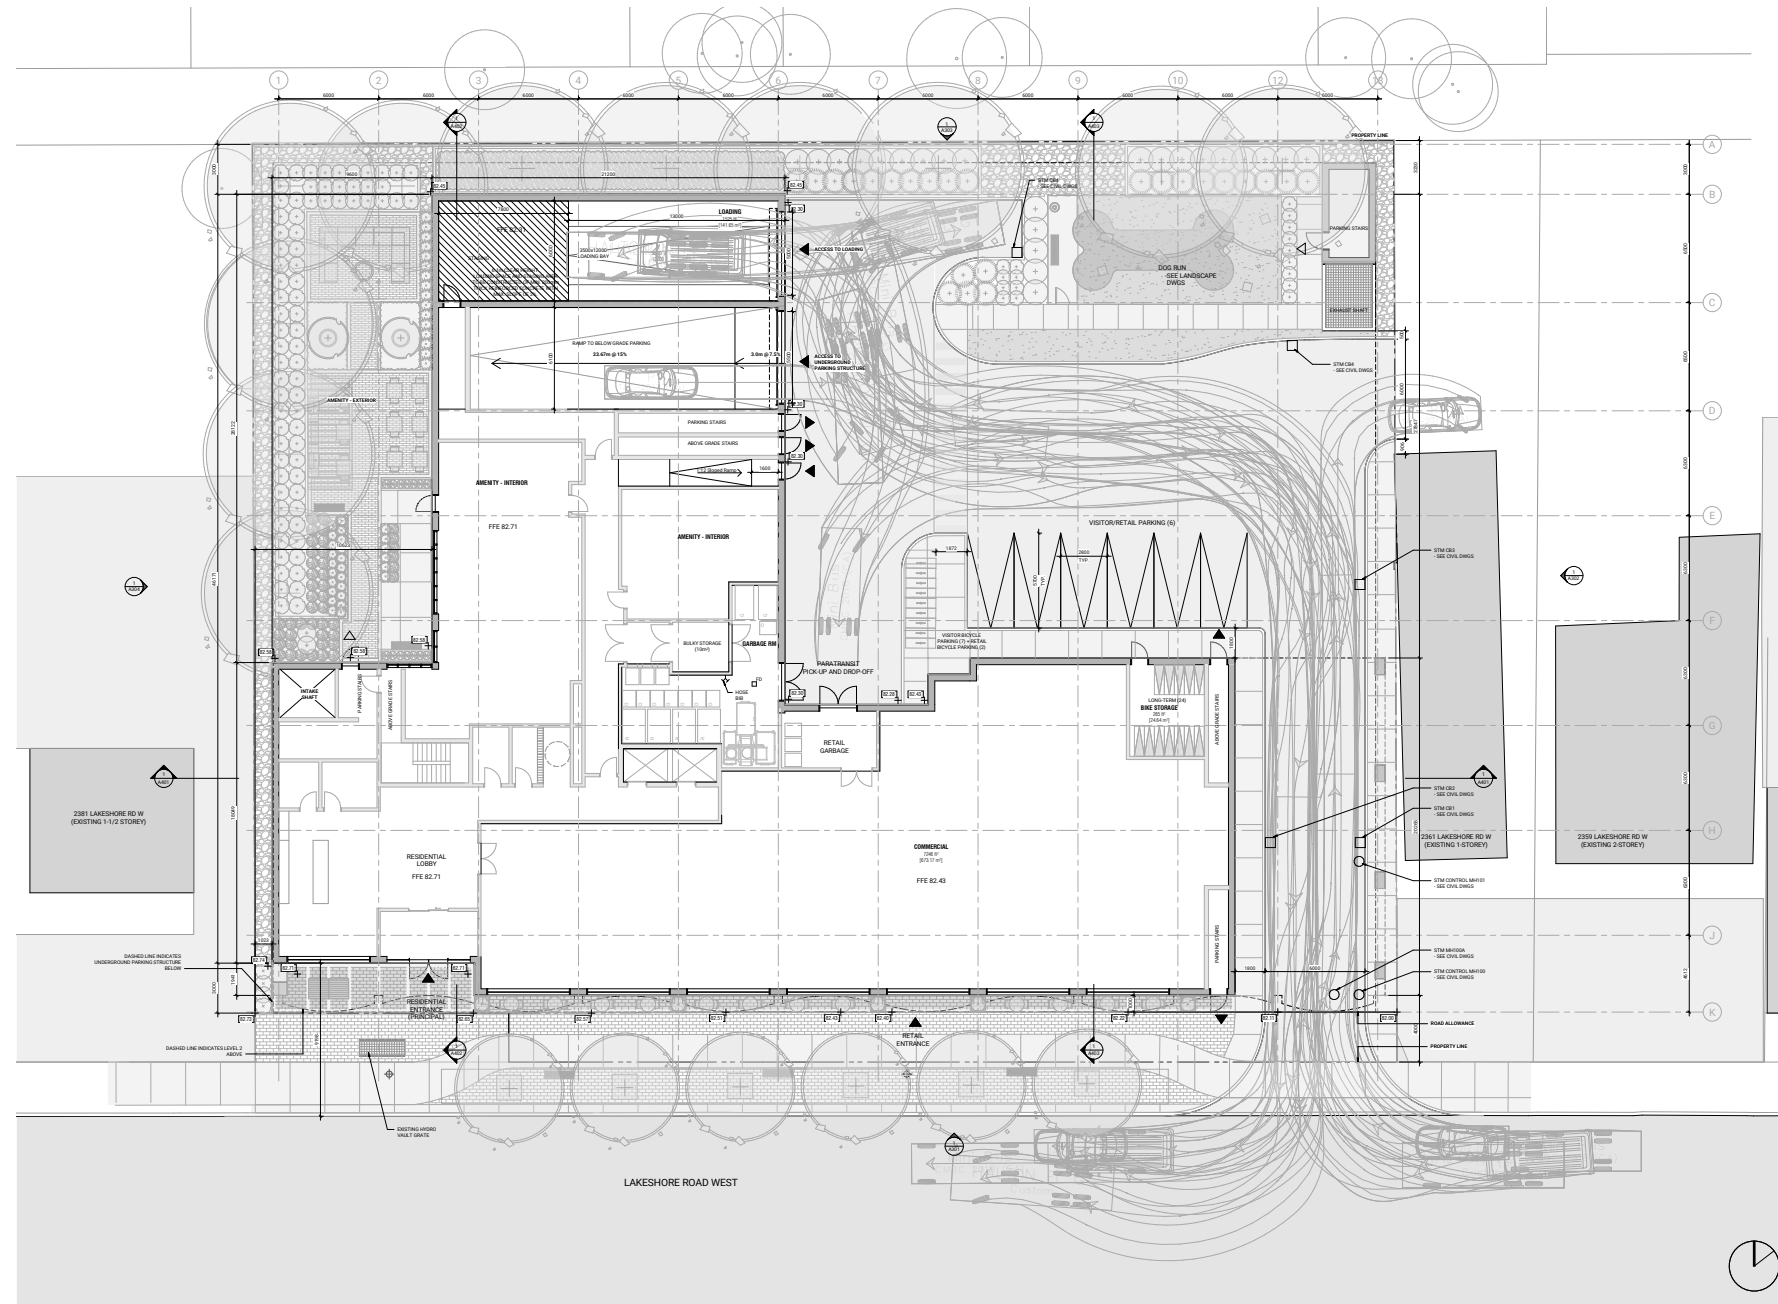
Ground Floor Plan (Prepared by Diamond Schmitt Architects)
